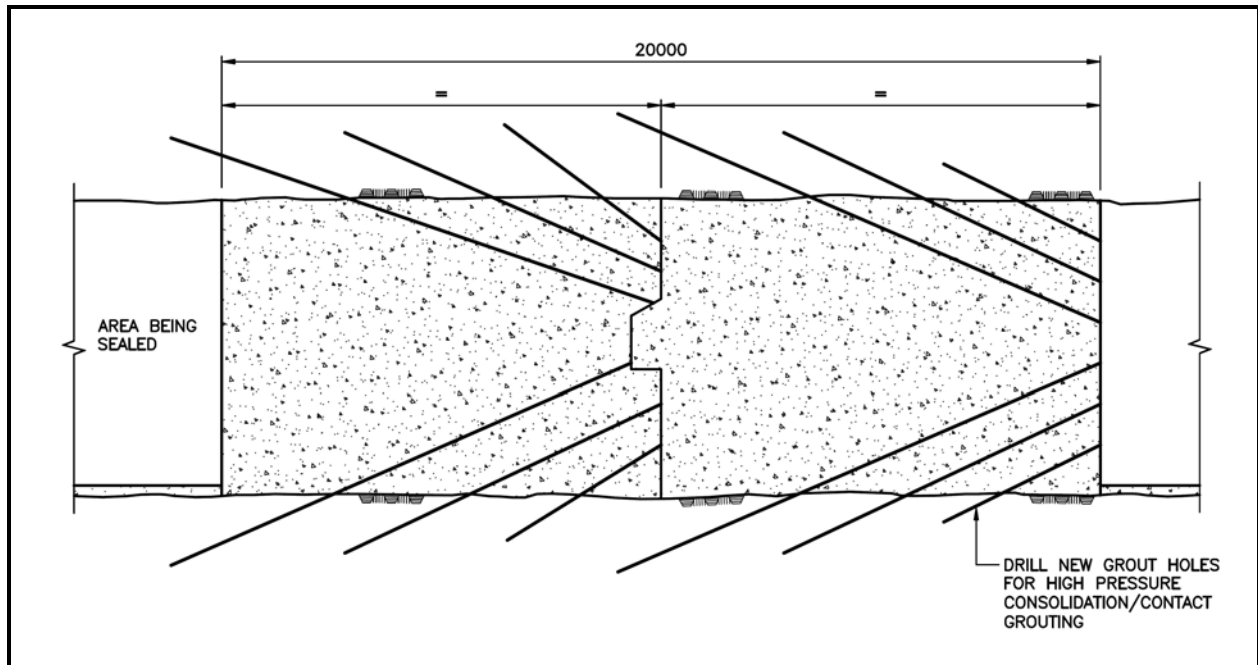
Conceptual Design for Access Tunnel Closure Wall
